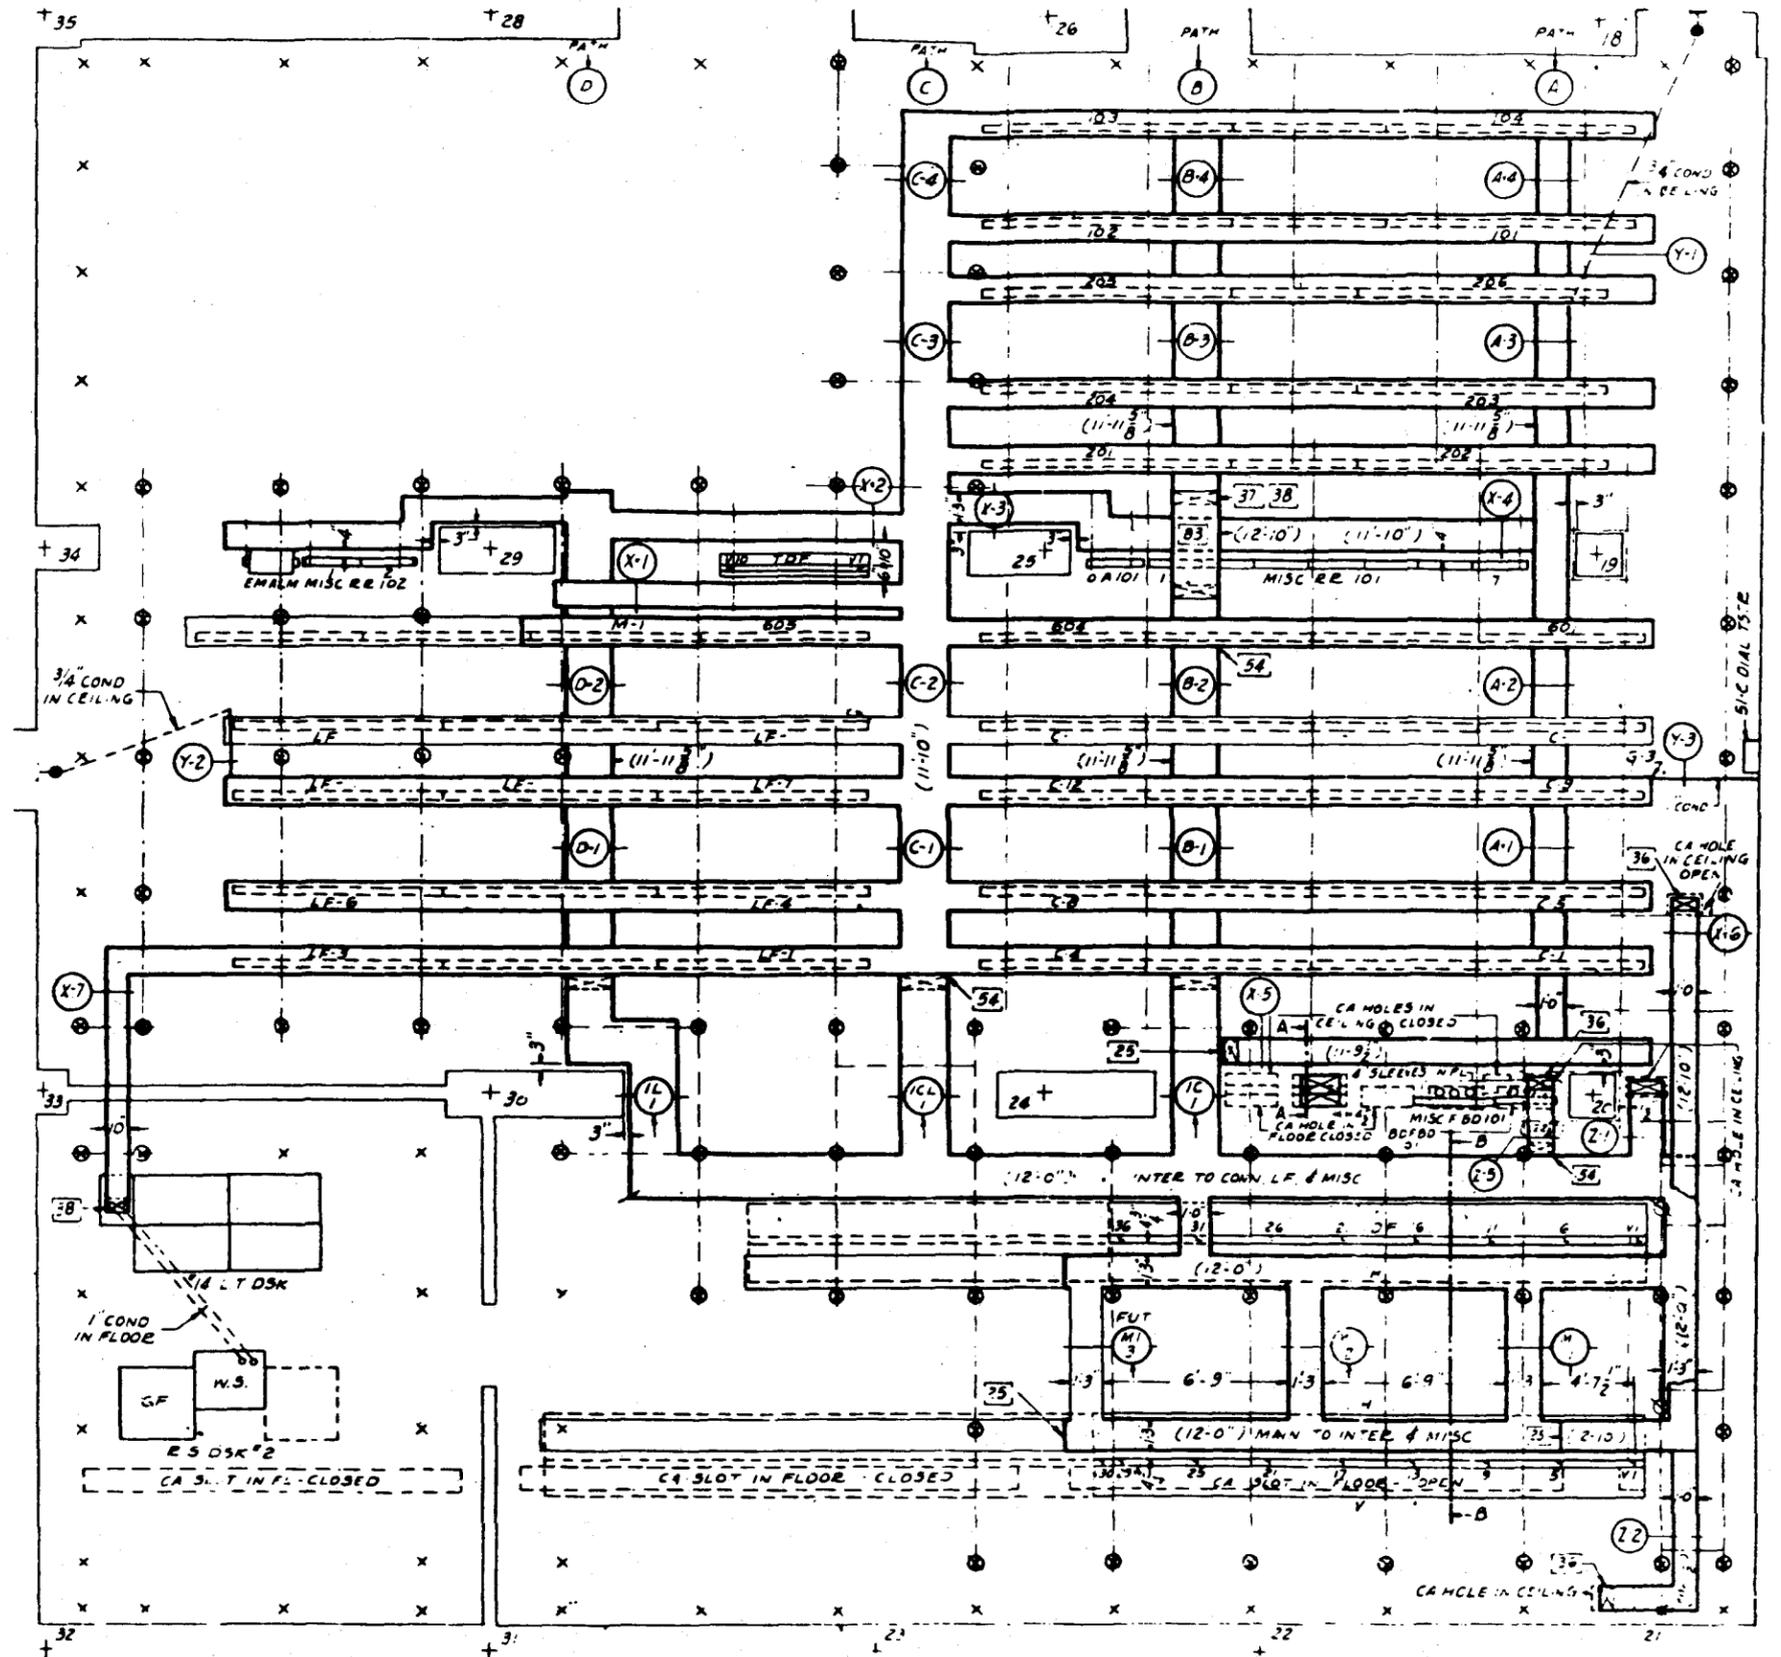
TYPICAL DOUBLE LINE CABLEING AND CABLE RACK PLAN DRAWING
